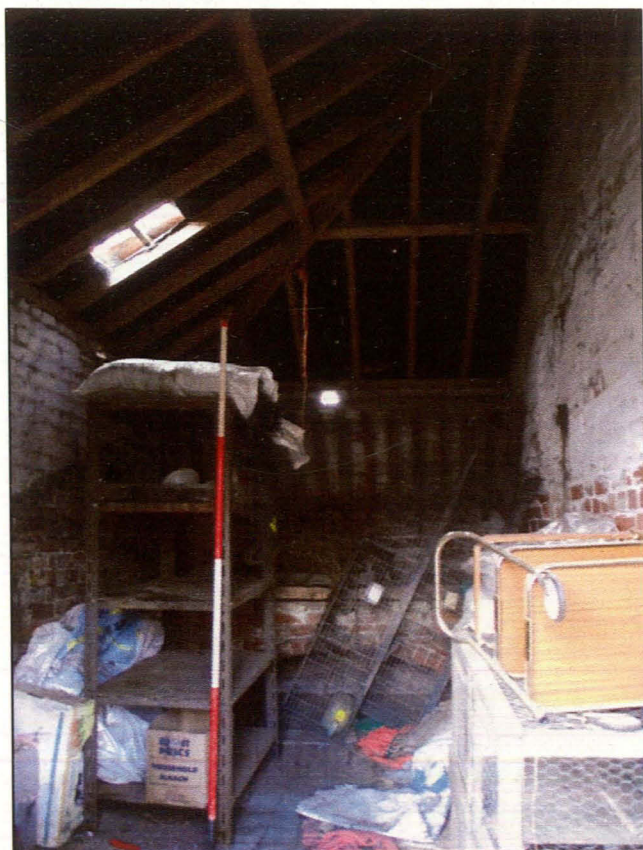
(Shot 42): General shot of barn B1 interior, showing vaulted brick built feeding trough and wooden hay rack. Looking west-south-west
